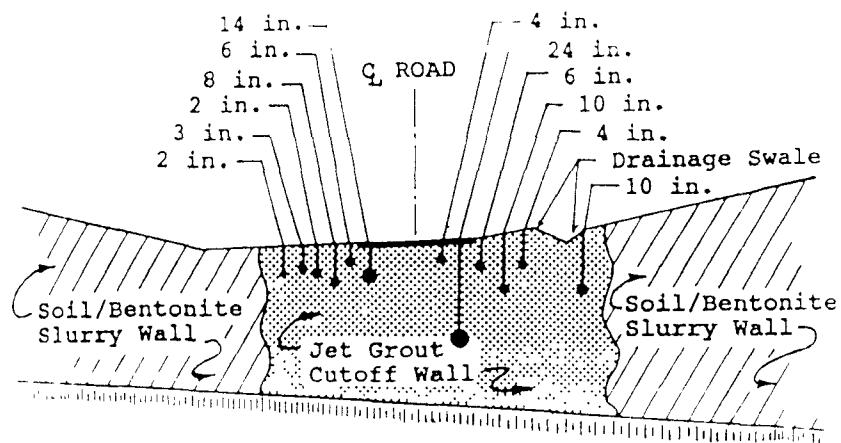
Vertical section taken through utility corridor in which jet grouted impervious barrier was constructed to join SB slurry walls [Gazaway and Jasperse, 1992].
